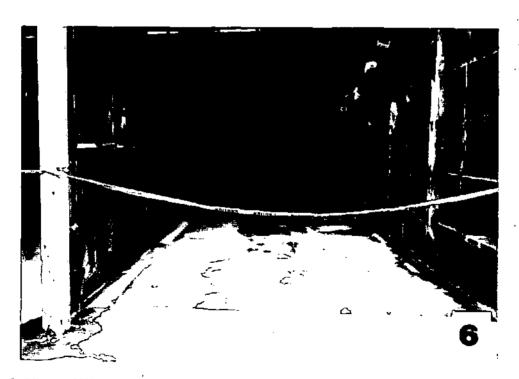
View of HWMU Plant 2, Area A looking at south wall from the east side of the building, prior to cleaning. Note dust along floor and ledges of wall.
